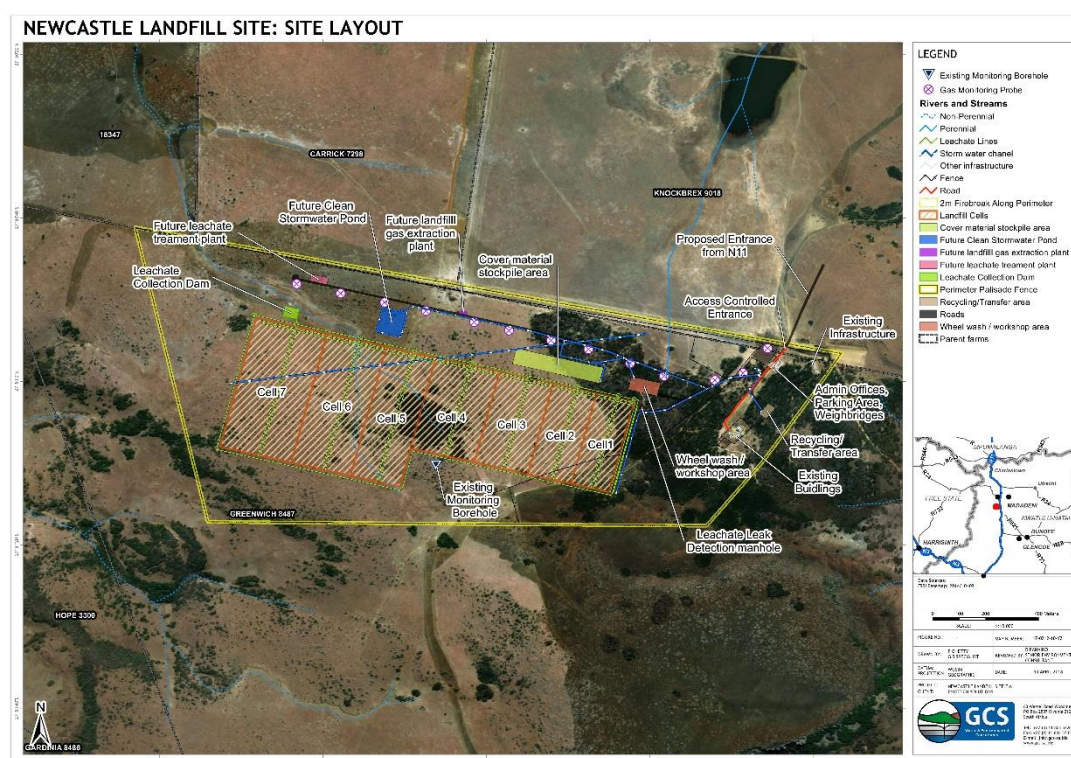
Layout of the Proposed Newcastle Local Municipality Landfill Site.
